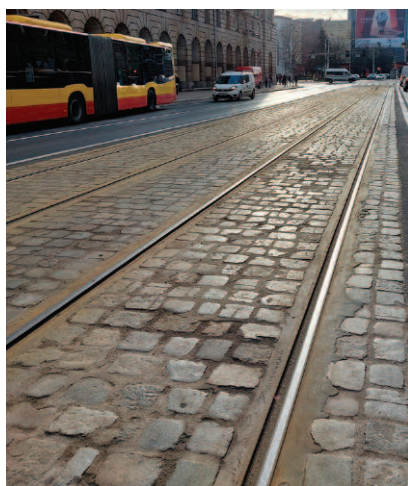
Tram tracks not burdened by road traffic, surface made of stone cubes, ul. Świdnicka on the section from Kościuszki Square to J. Piłsudski Street (12/2023)
